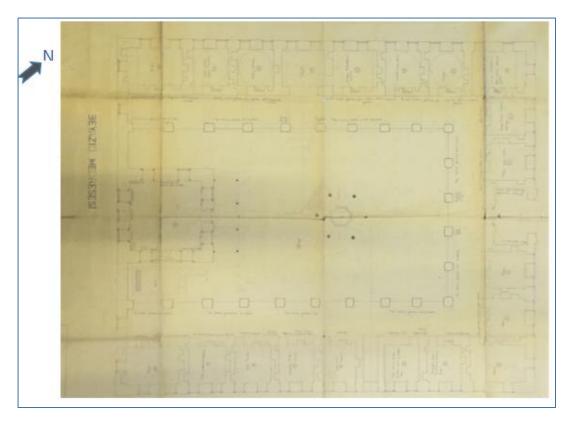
Plan of Beyazıt Medrese, 1970 (archive of IRDF)
